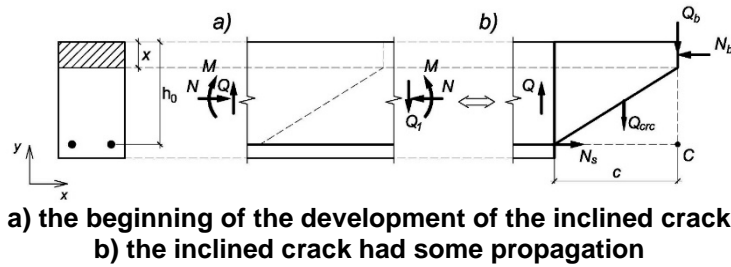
Equilibrium of a section of the reinforced concrete beam with an inclined crack
